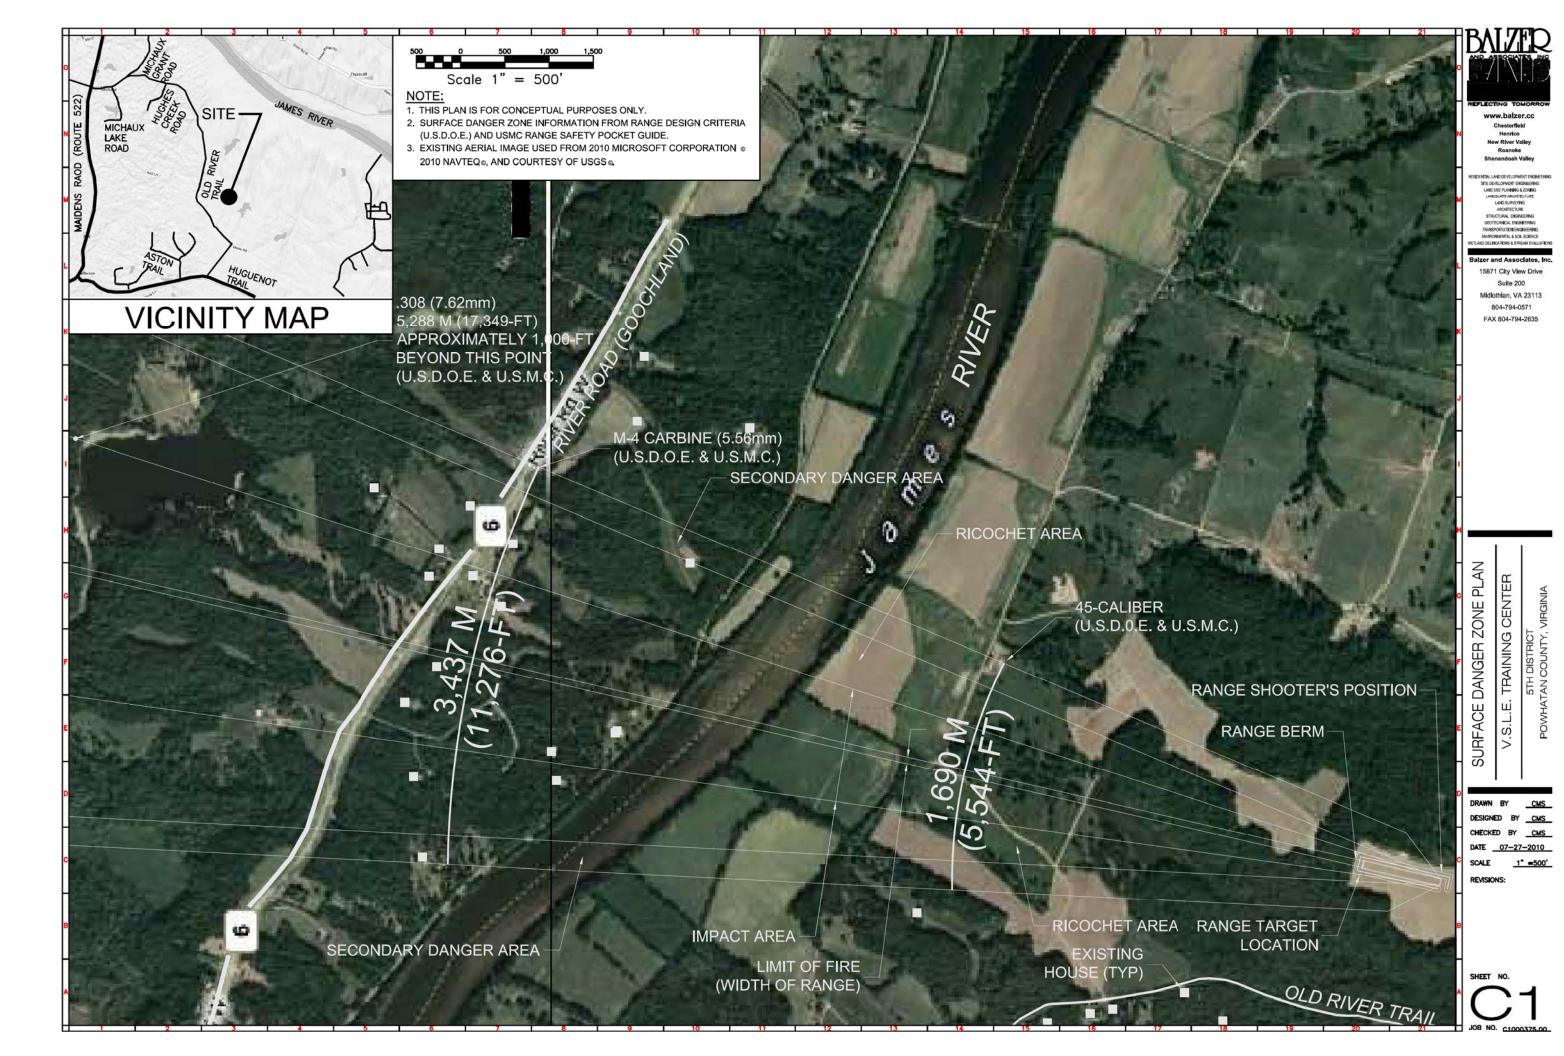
Sheet C-1 Surface Danger Zone (SDZ) Plan (Large Area)
